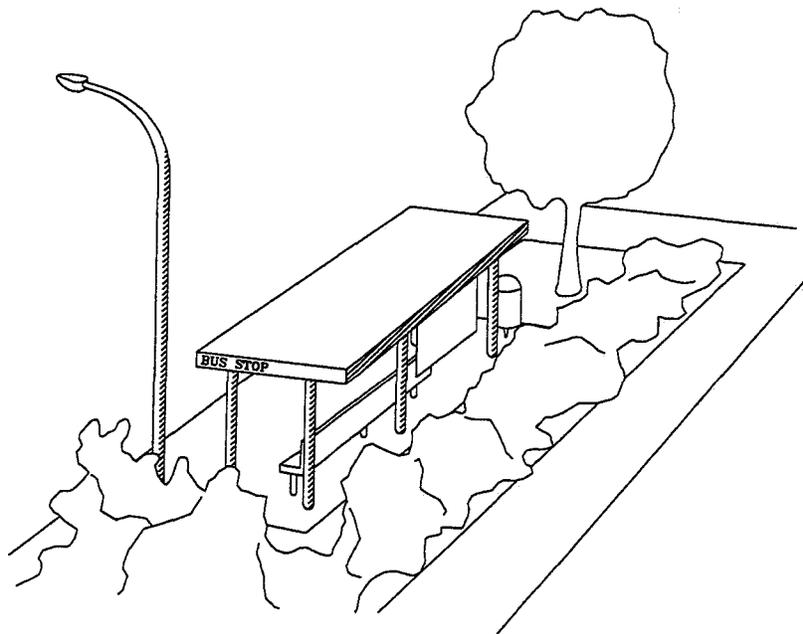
Example of Coordinating Shelter Locations with an Existing Street Light.
